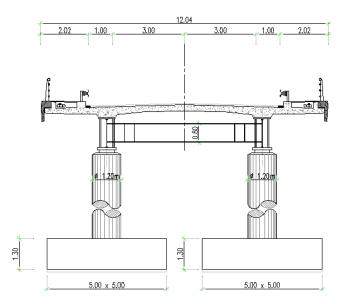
Cross-section of the composite bridge (SBRI, 2013)
